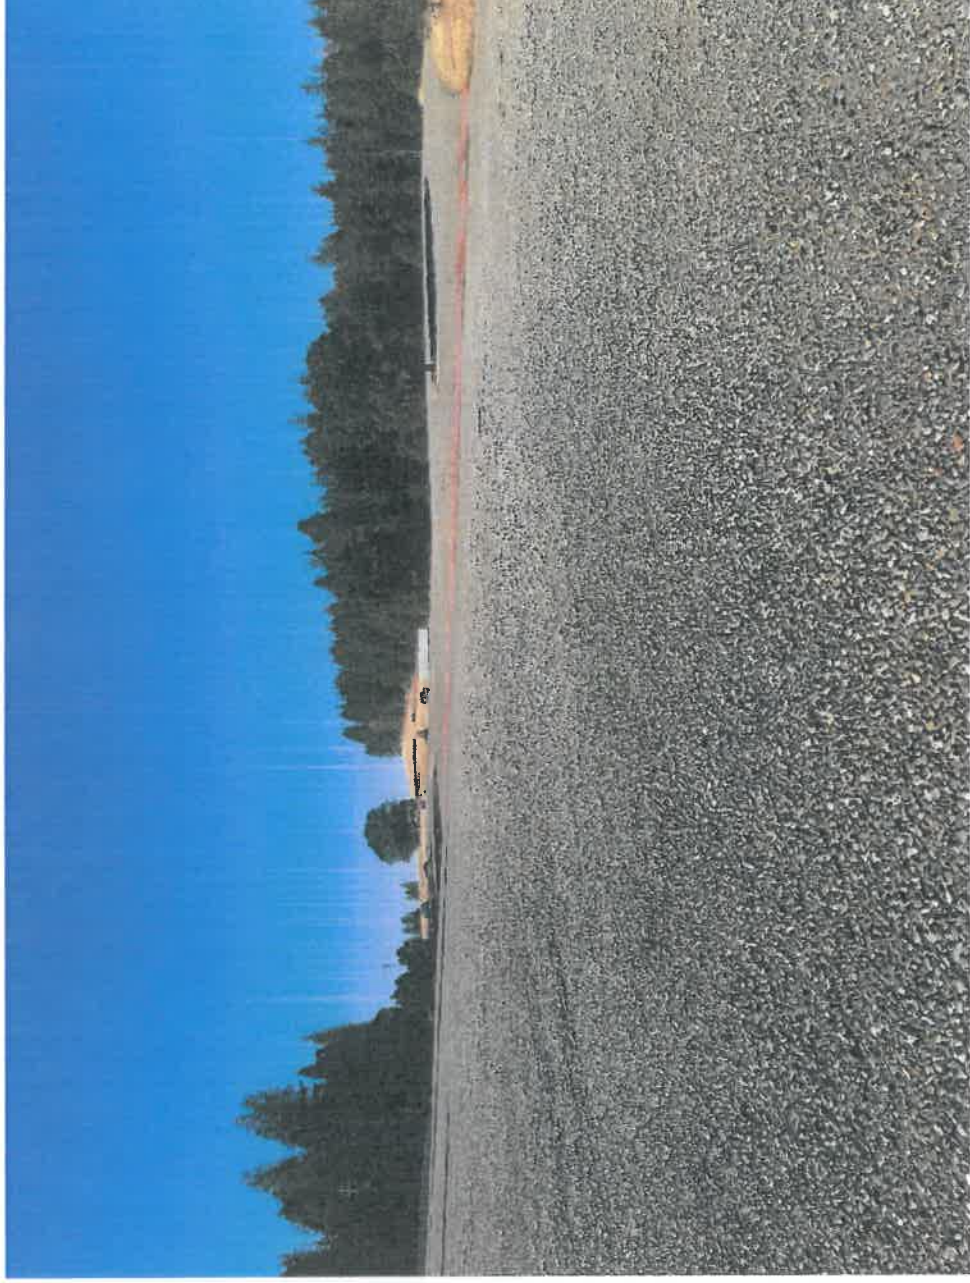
Looking southwest from corner of McCourtney Road and Auburn Road towards center of parcel
